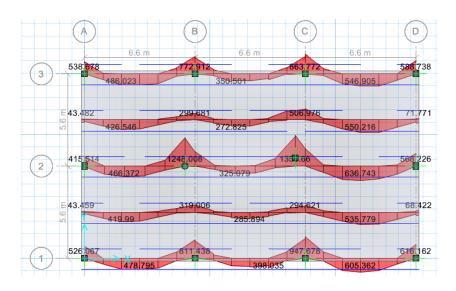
Along longer side reinforcement(SAFE:ACI ,with staggered column)
